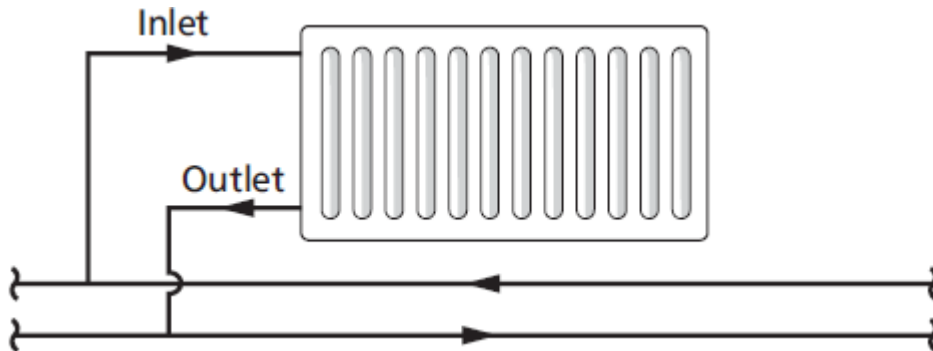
Schematic arrangement of 'top entry, bottom exit same end connection' radiator
